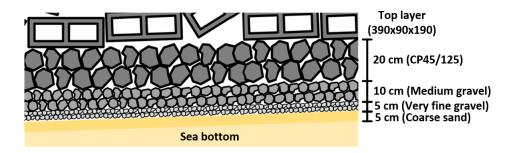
Side view of a block reef strip with top layer: 390x90x190 mm
